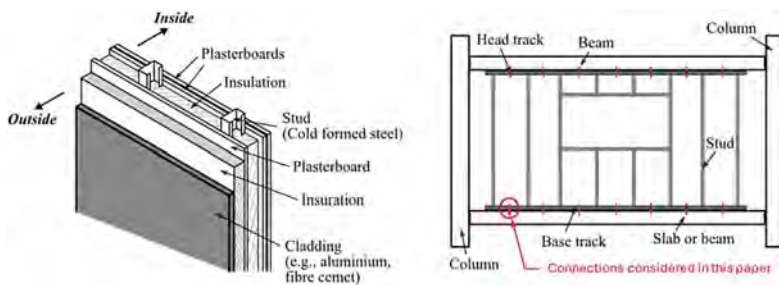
Exterior infill wall: (left) notations of infill wall components; (right) notations of lightweight cold-formed steel members and surrounding primary structure.
